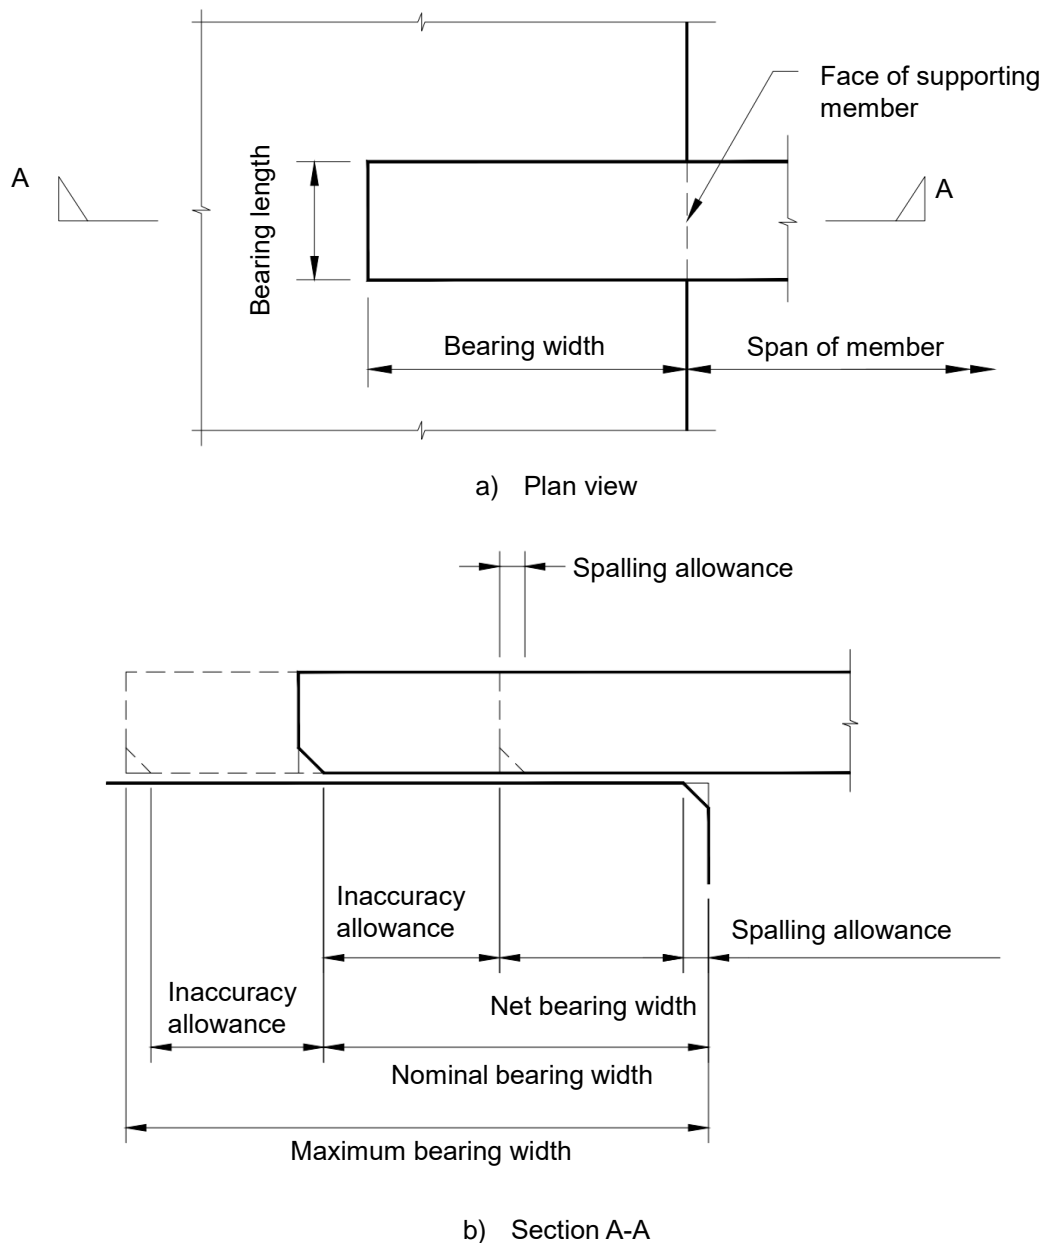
SCHEMATIC ARRANGEMENT OF ALLOWANCES FOR BEARING
